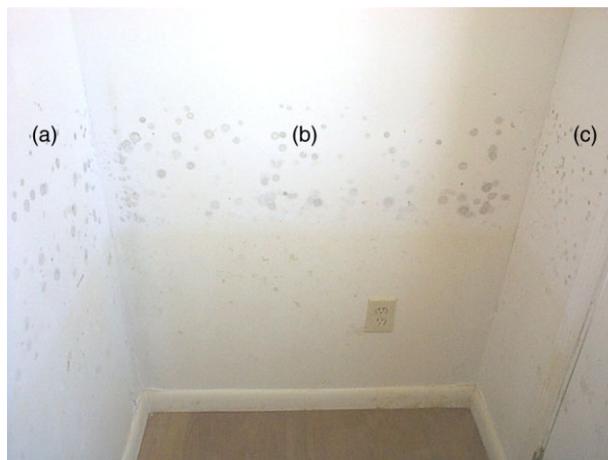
Effect of short-term (3 days) flooding on three walls: (a) south exterior, (b) west exterior and (c) interior wall (Aglan *et al.* 2005).
